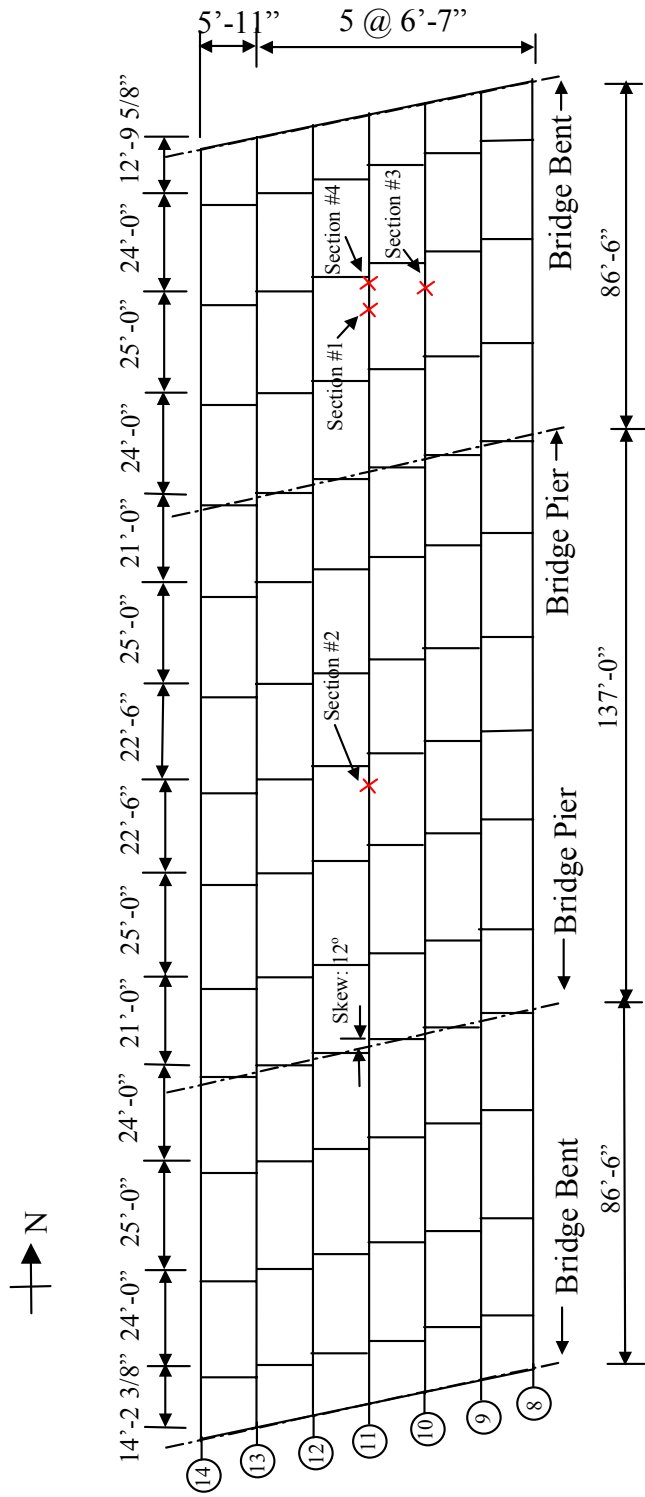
Framing Plan and Monitored Locations for the I-65 SBL Bridge
